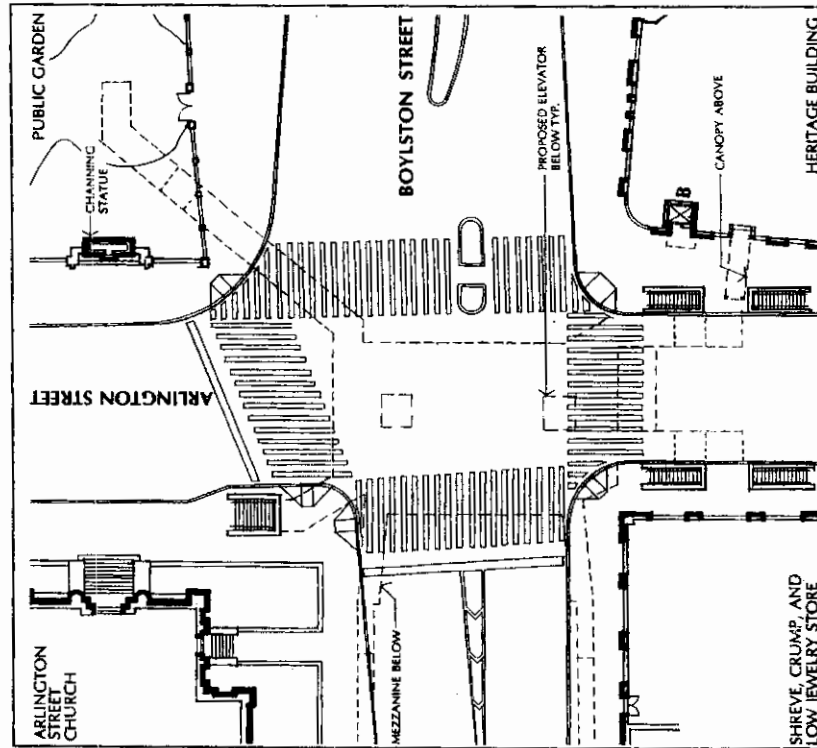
Elevator Option B, street level Scale: 1"=32'
